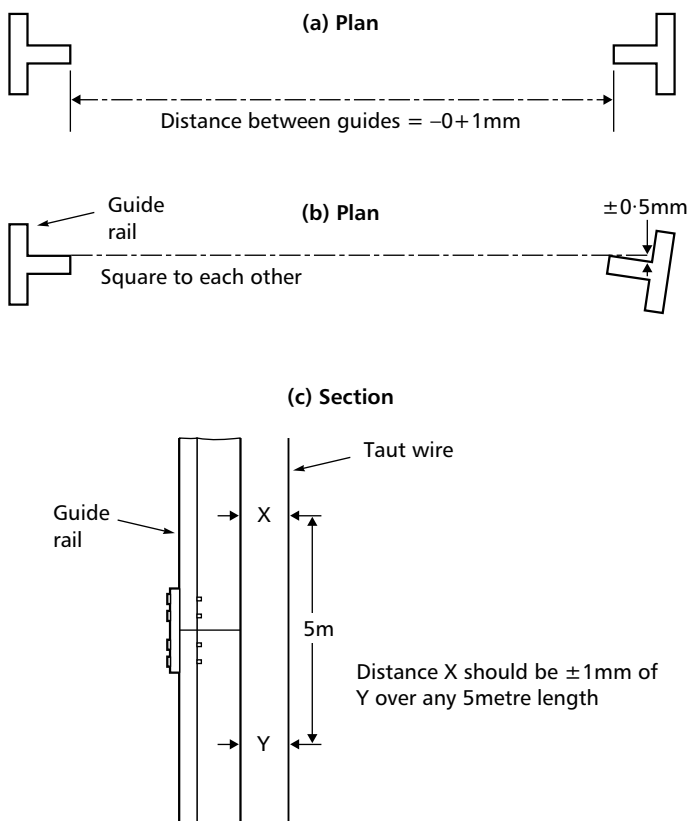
Alignment of rails; (a) tolerance on distance between guides, (b) tolerance on accuracy of angular alignment, (c) tolerance on vertical alignment
